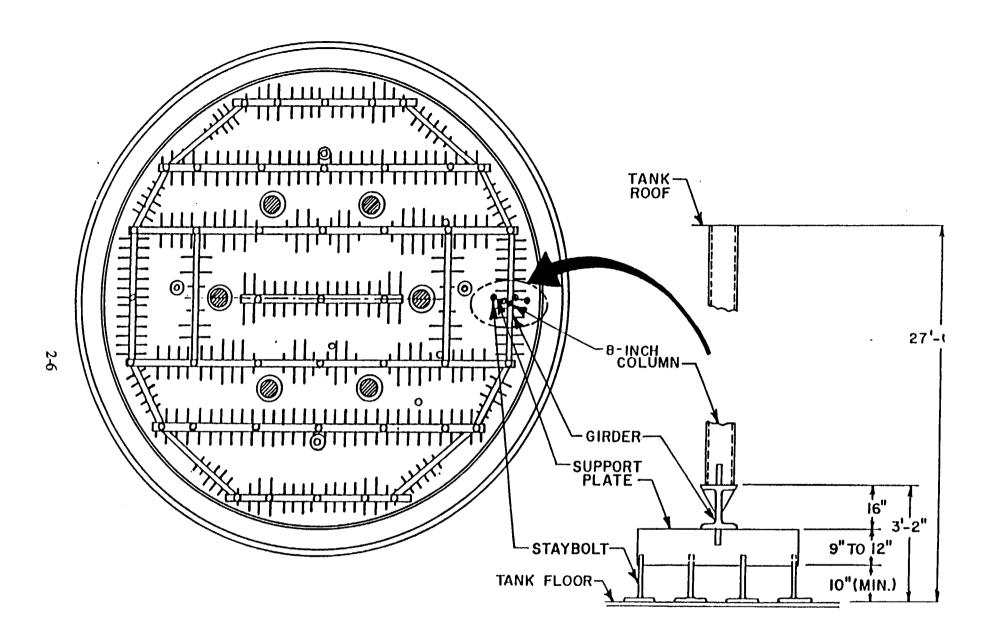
Plan and elevation above internal gridwork for Tanks 8D-1 and 8D-2 (Prowse and Schiffhauer, 1991)
